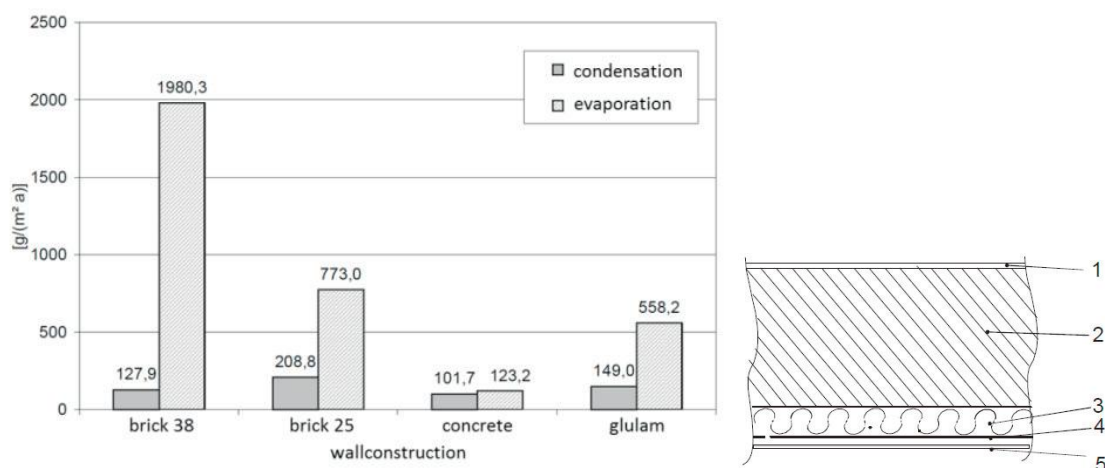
(left) Annual condensation and evaporation potential for different wall constructions, (Bergmann and Weiss, 2002). (right) Wall constructions: (1): interior plaster, (2): brick 38cm / brick 25cm / concrete, (3): insulation, (4): absorber, (5): glazing (Similar configuration for “glulam” with more wooden layers) source (Bergmann and Weiss, 2002).
